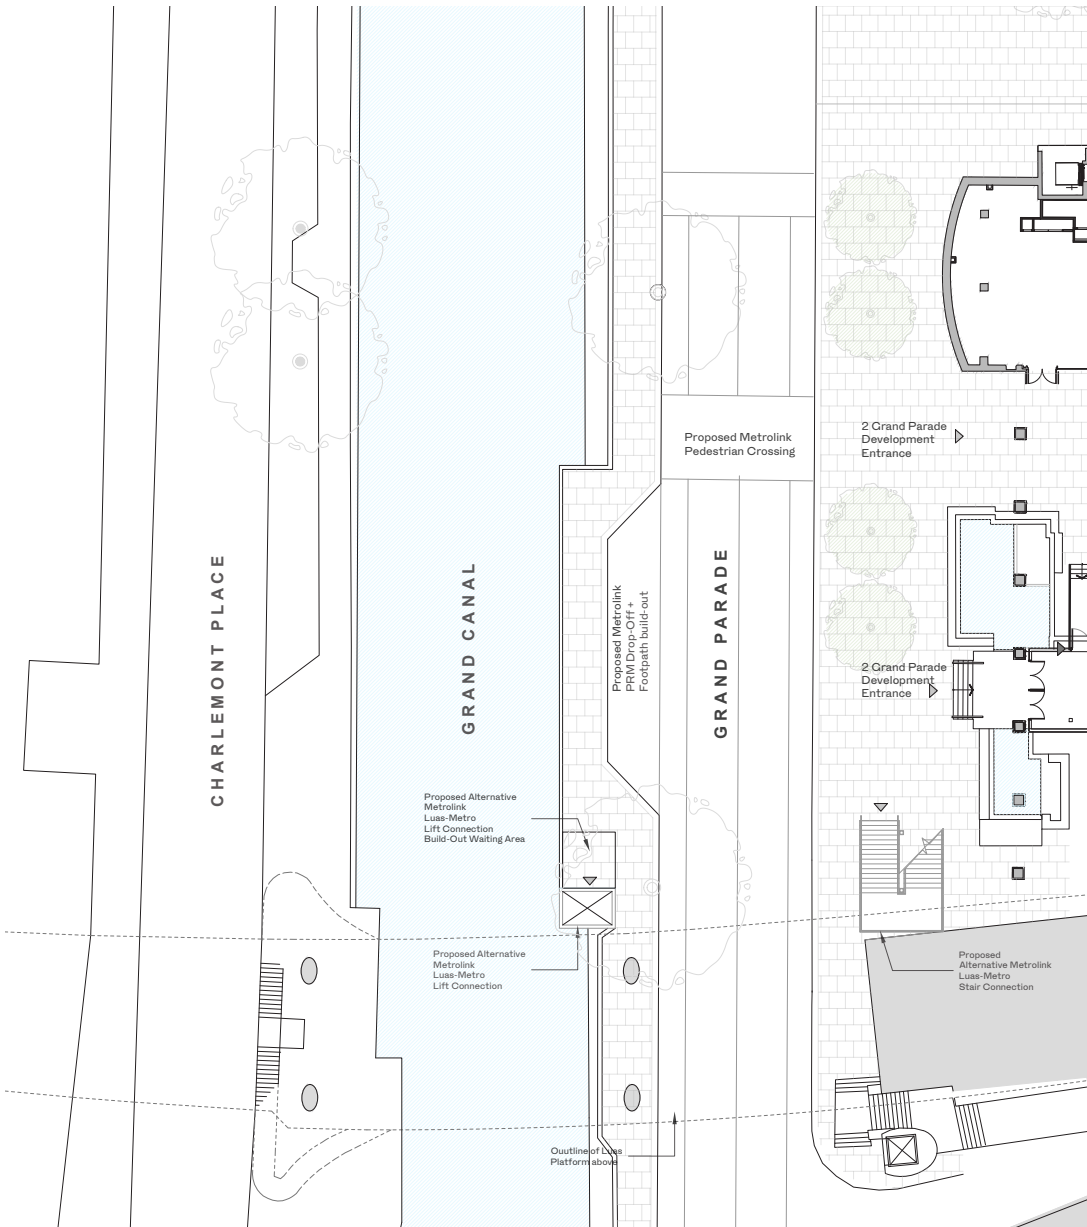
B Proposed design intent at street level for the reconfigured stair and lift.
